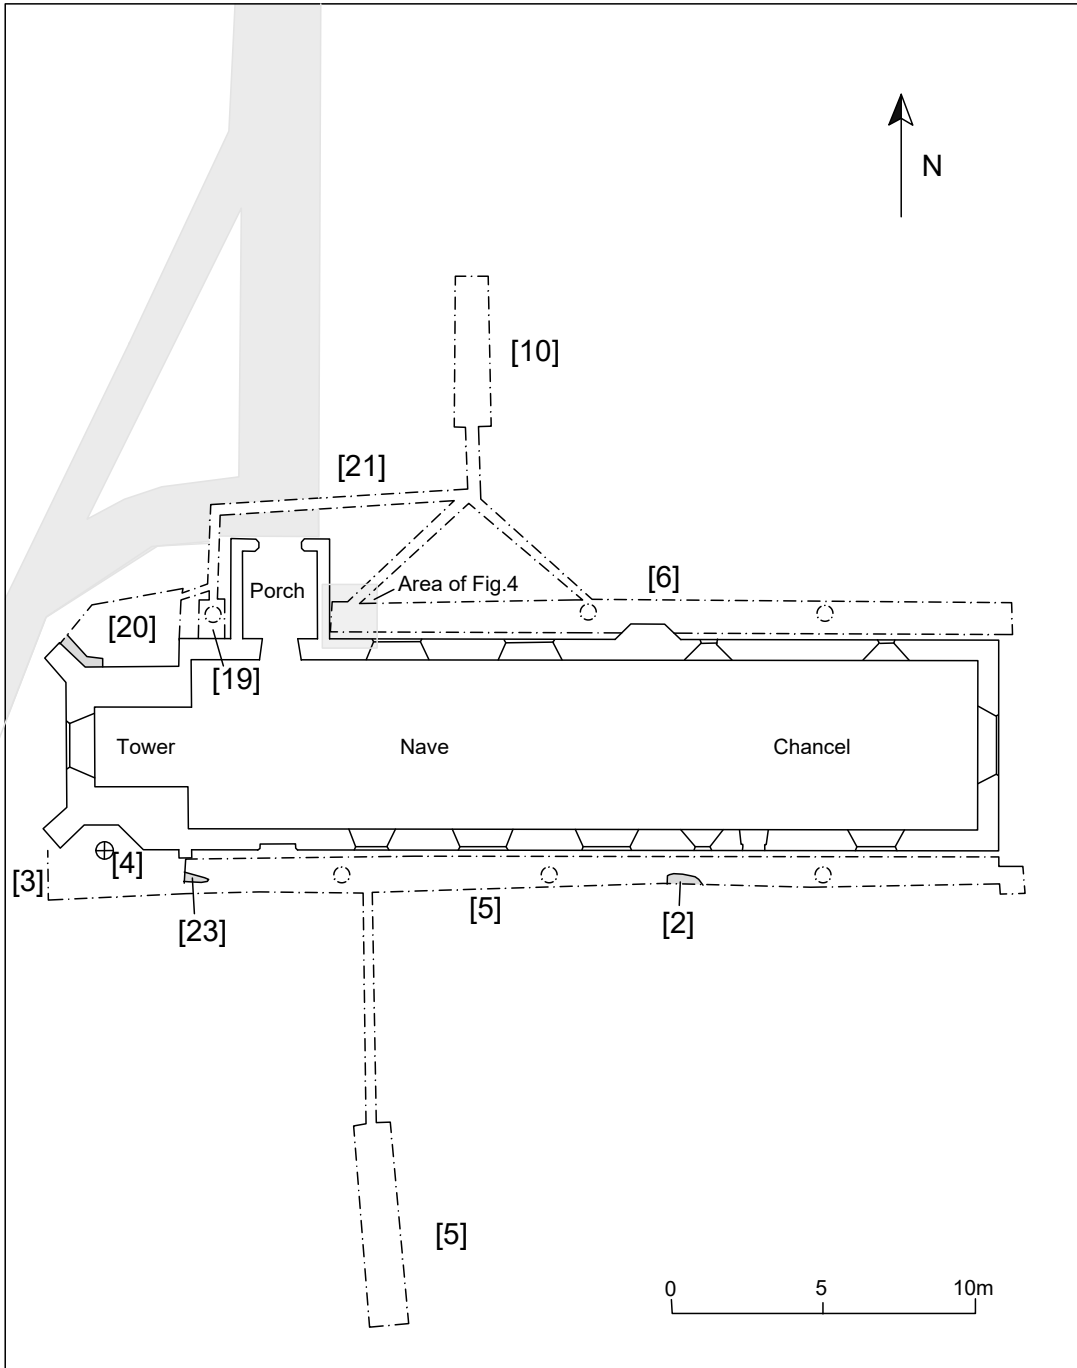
St Peter's Church with excavated trenches. Scale 1:250
